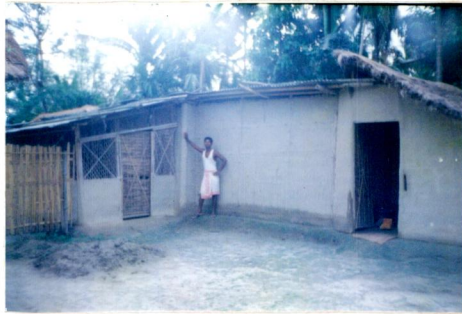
MATERIALS USED IN HOUSE CONSTRUCTION
